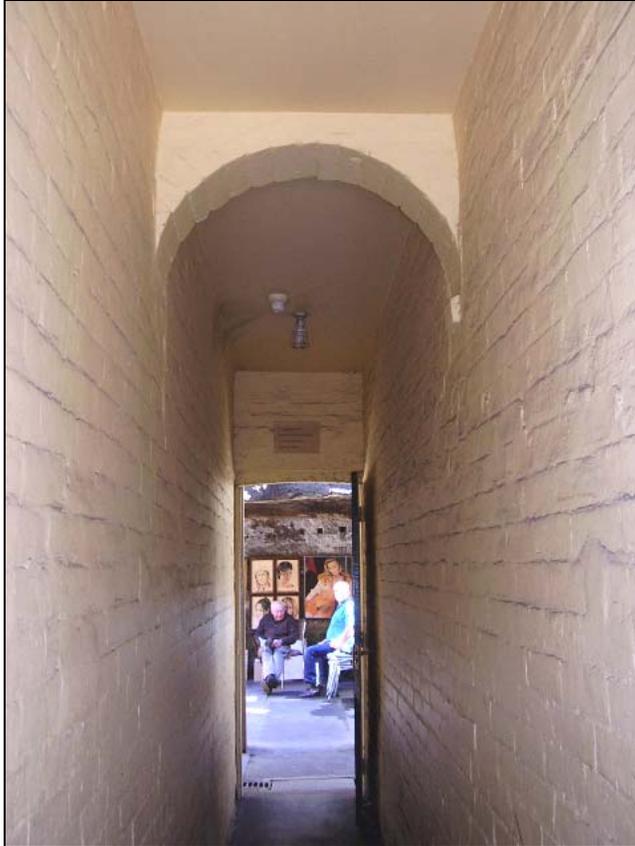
View of the passage between Nos. 19 and 21. Like the southern passage, it is simply finished with painted brick walls and also features a central brick arch.
